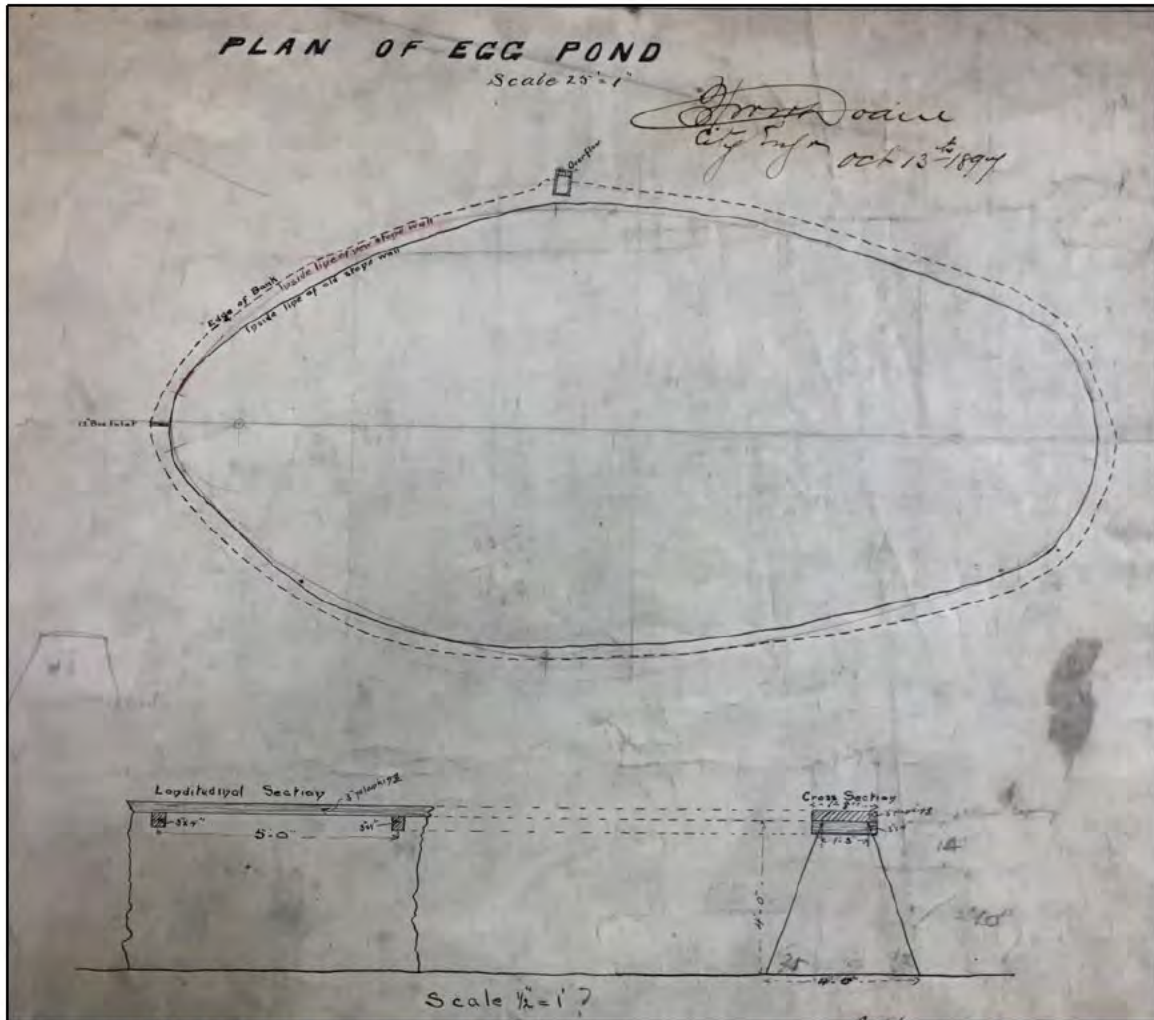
A plan of a proposed masonry wall around Egg Pond, 1897.<sup>321</sup> The plan shows an existing stone wall's inside line (solid) and proposed inside edge of a new wall (dotted line), along with a 12" box inlet on the north end and an overflow box on the east side.
